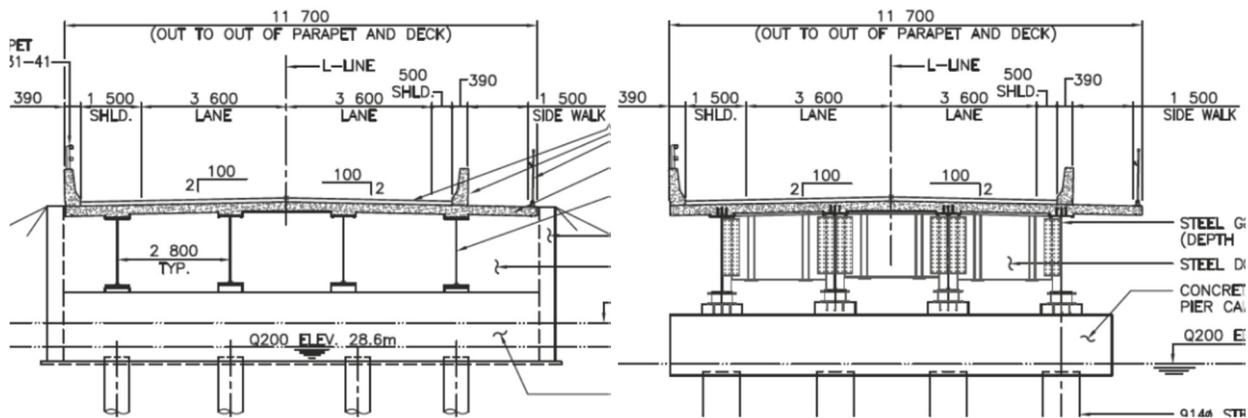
Final design concept: Cross Sections at the abutment (left) and at the pier (right) [BC MoTI]
